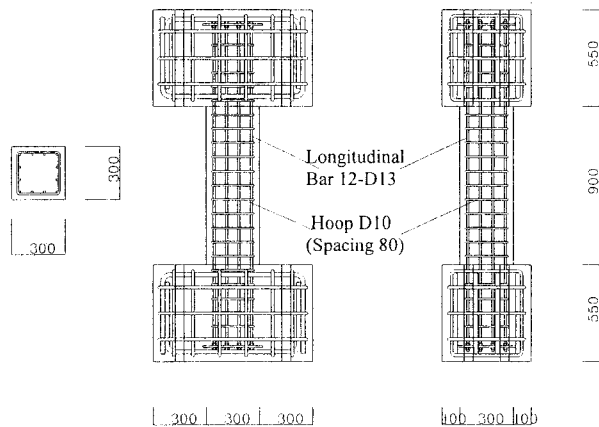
Reinforcing Bar Arrangement and Specimen Geometry of Column Specimen
